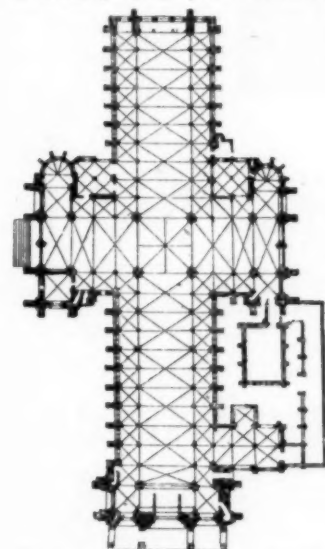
Plan of the Cathedral of Laon [13th Century].
